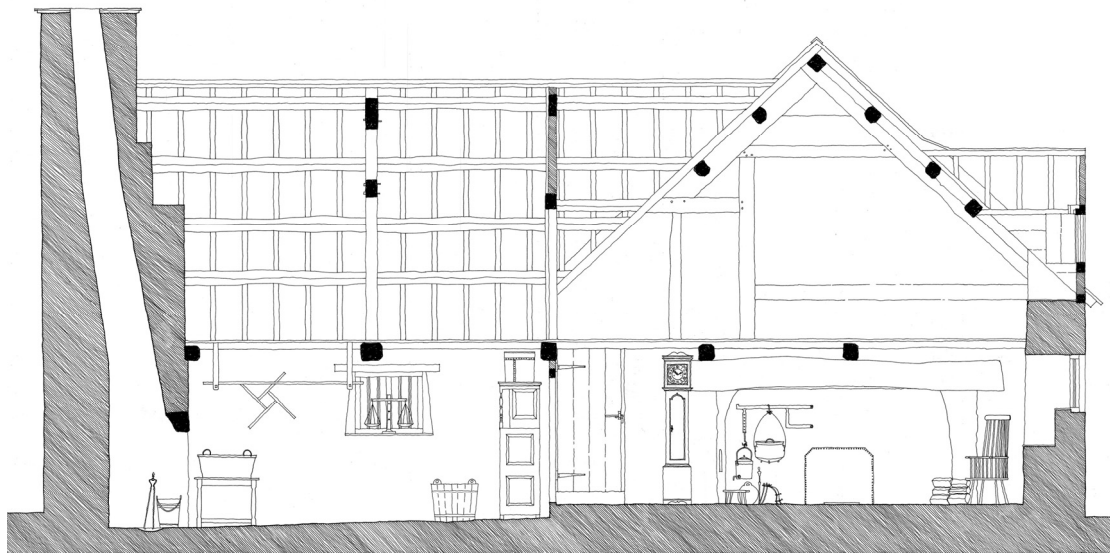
A wing and an extra floor was added in the roof space to provide additional accommodation at Cilewent longhouse 1:100
